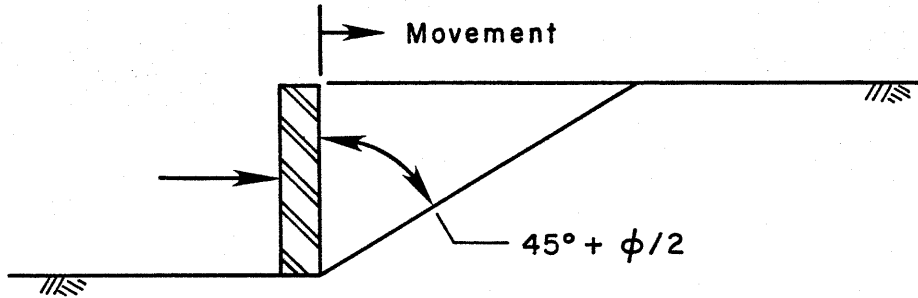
Shear Plane for Passive Failure of Soil Behind Retaining Wall
